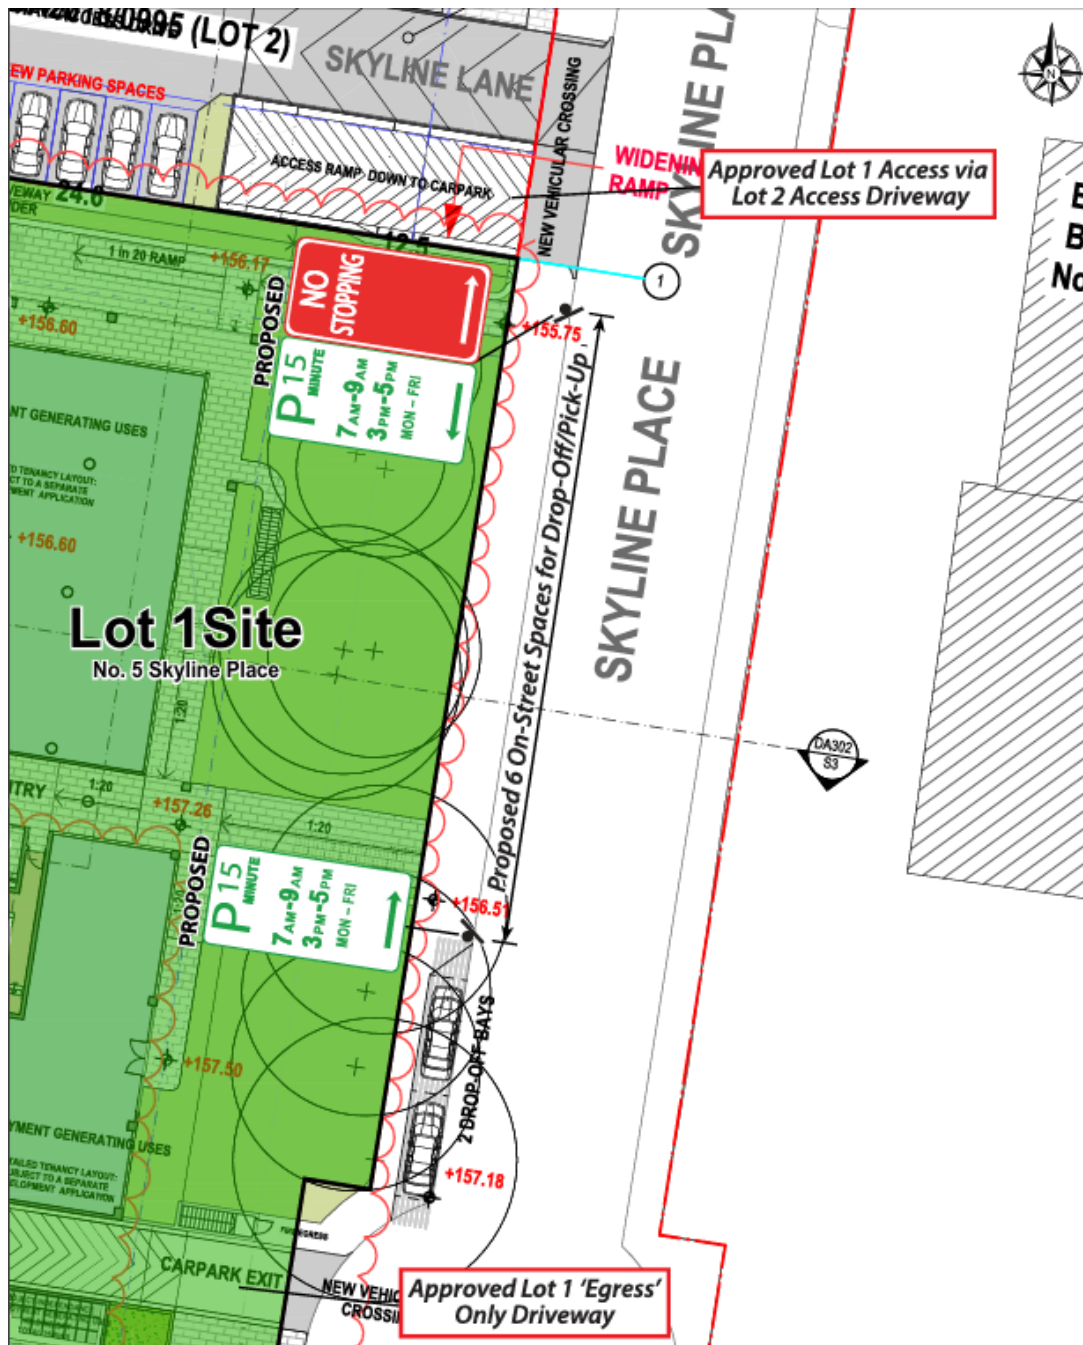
Proposed Parking Restrictions Plan showing proposed pick up and drop off zone (Source: Traffic and Parking Assessment Report, Appendix 10)
